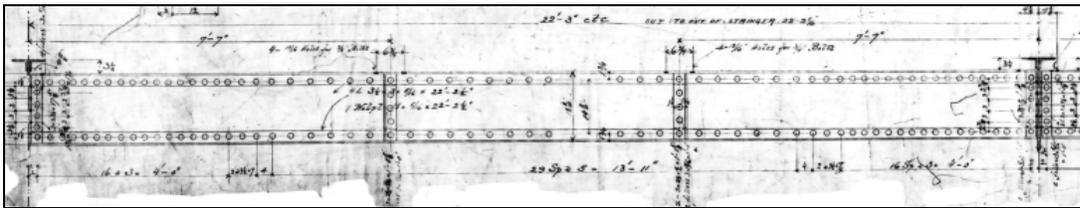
An excerpt from the as-constructed drawing showing a typical stringer detail and stringer to floor beam connection.
